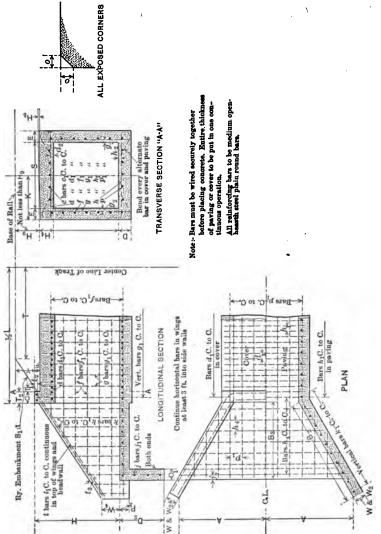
Chicago G. W. Ry. Standard Reinforced Concrete Culvert.
